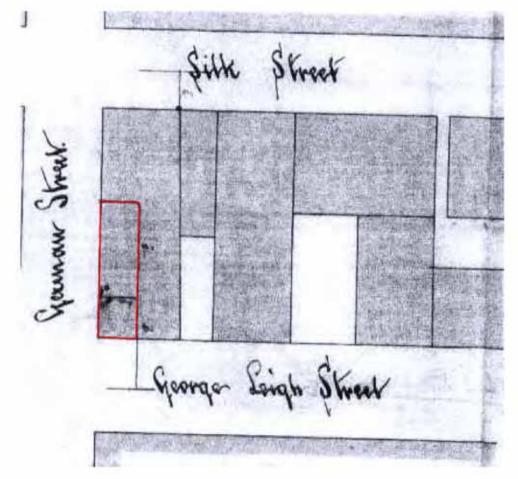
Deposited building plan dated 1881, showing proposed changes to the building
